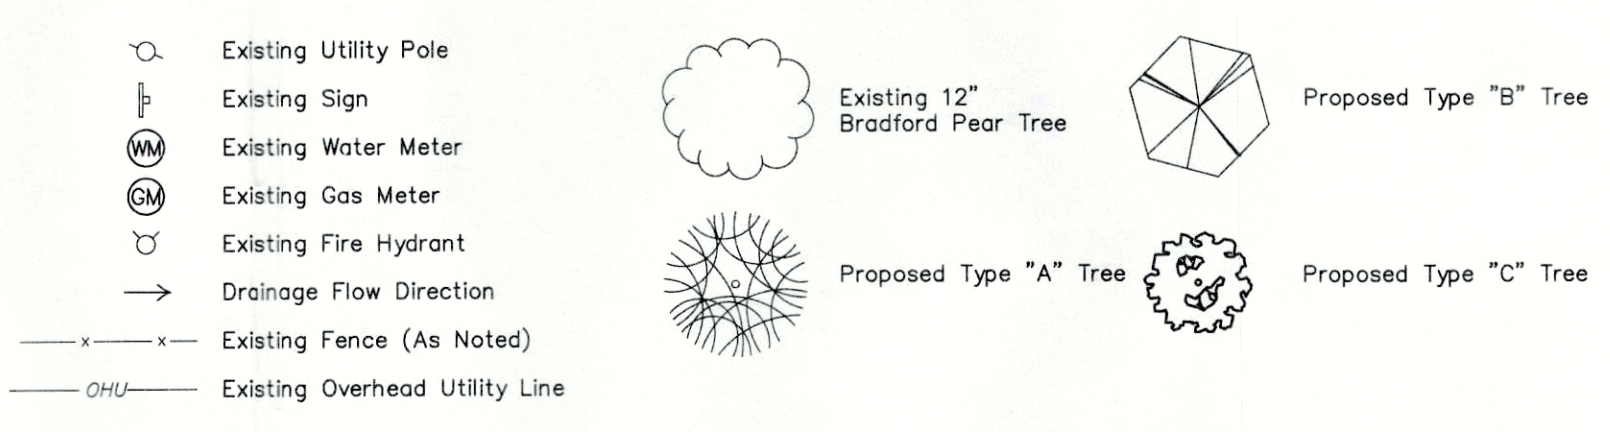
DETAIL DISTRICT DEVELOPMENT PLAN APPLICATION FOR ZONING CHANGE
